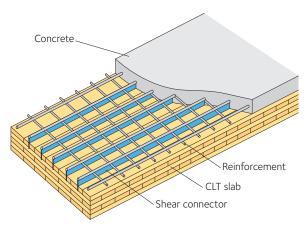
Composite floor structure in CLT and concrete, with shear connector of type HBV, Holz-Beton-Verbund.
